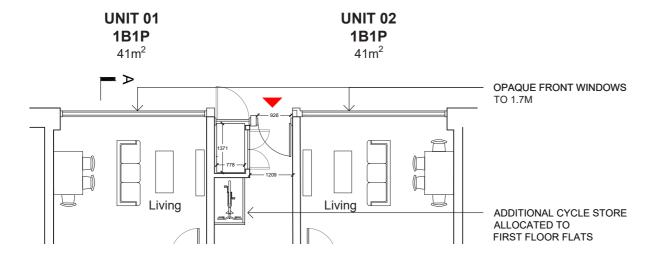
Amended partial ground floor plan (subject of this S73 application)
